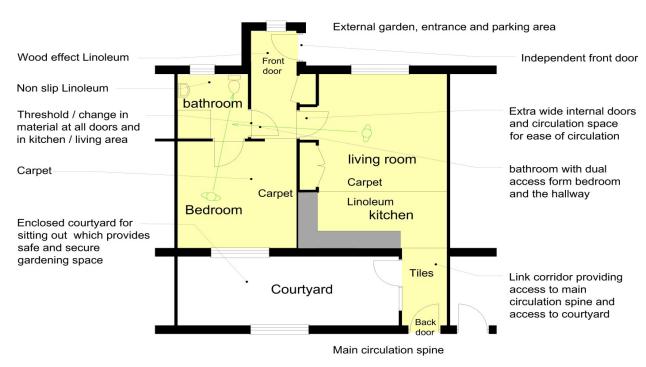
Floor plan of typical I bedroom unit (plans are not to scale and are indicative only)
